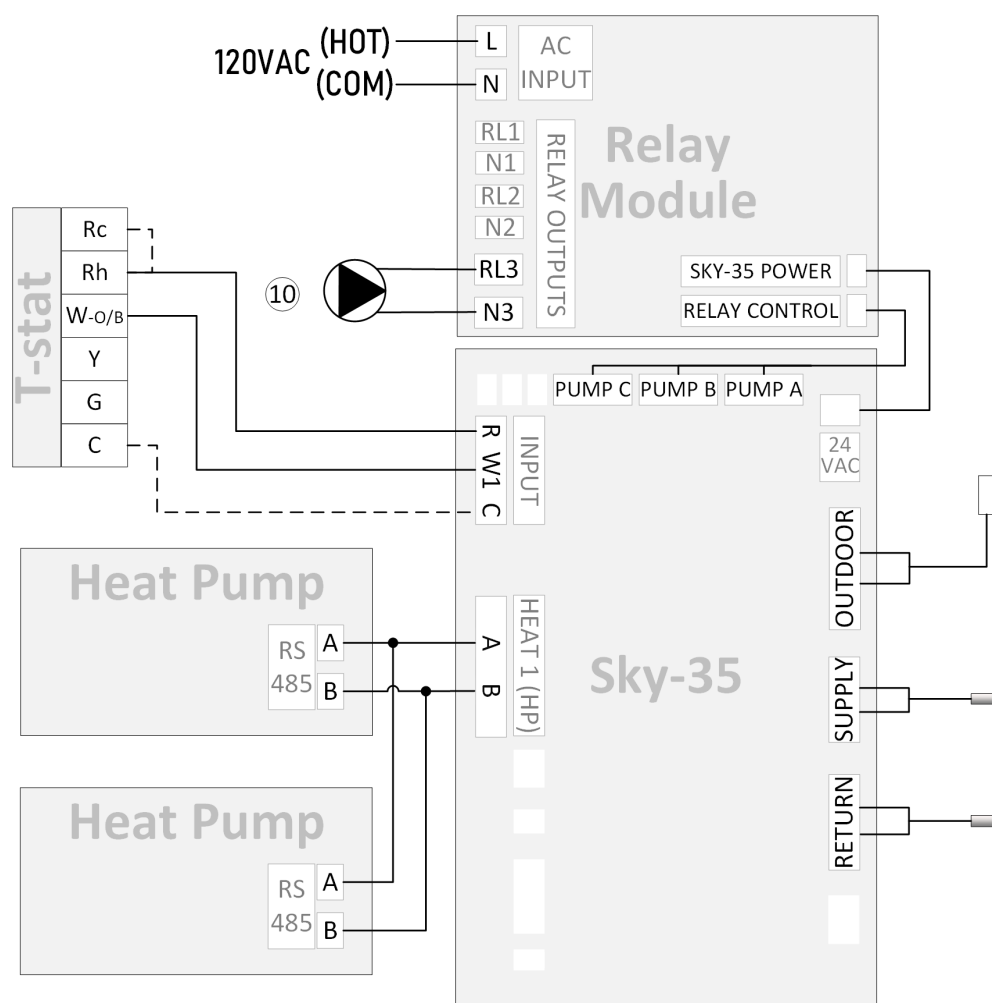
Concept drawing: Multiple heat pumps space-heating (without buffer tank)
